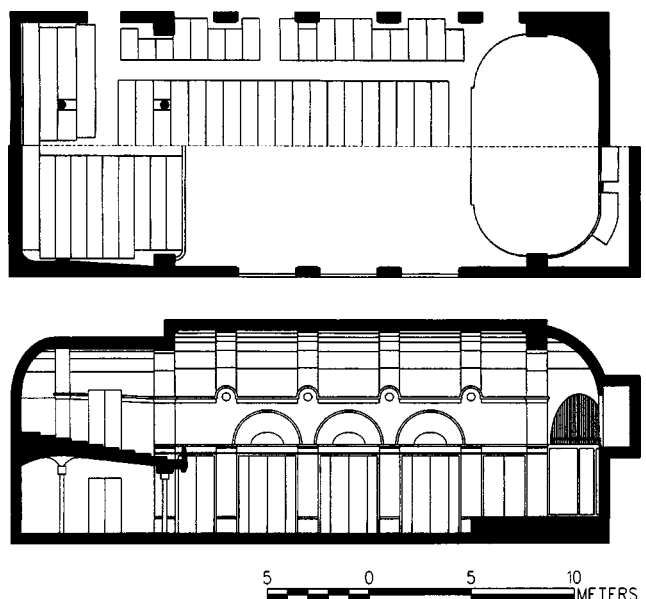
Zurich, Kleinersaal Tonhalle, ZT, plan and section.
